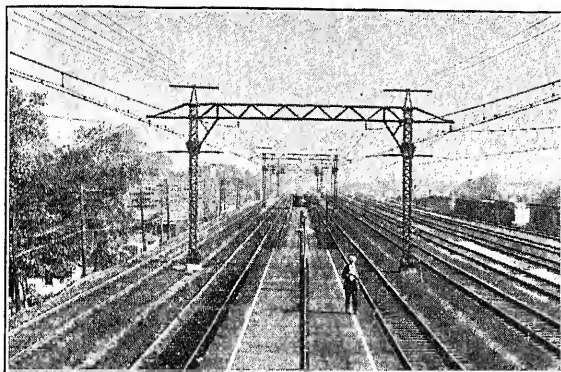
TYPICAL 4-TRACK CONSTRUCTION
